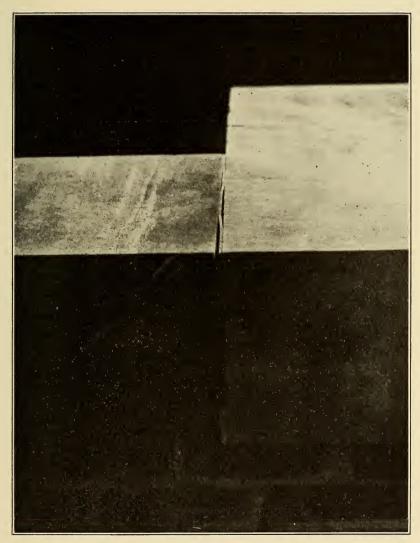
Photograph of offset in parapet wall illustrating the effects of differential expansion between limestone and reinforced concrete
